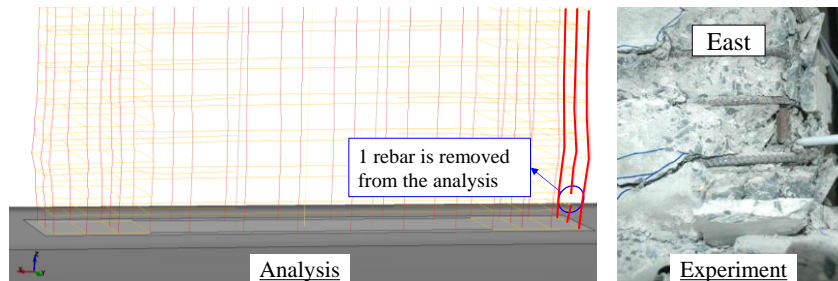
Reinforcement buckling in wall specimens tested by Pakiding et al. (2014).
